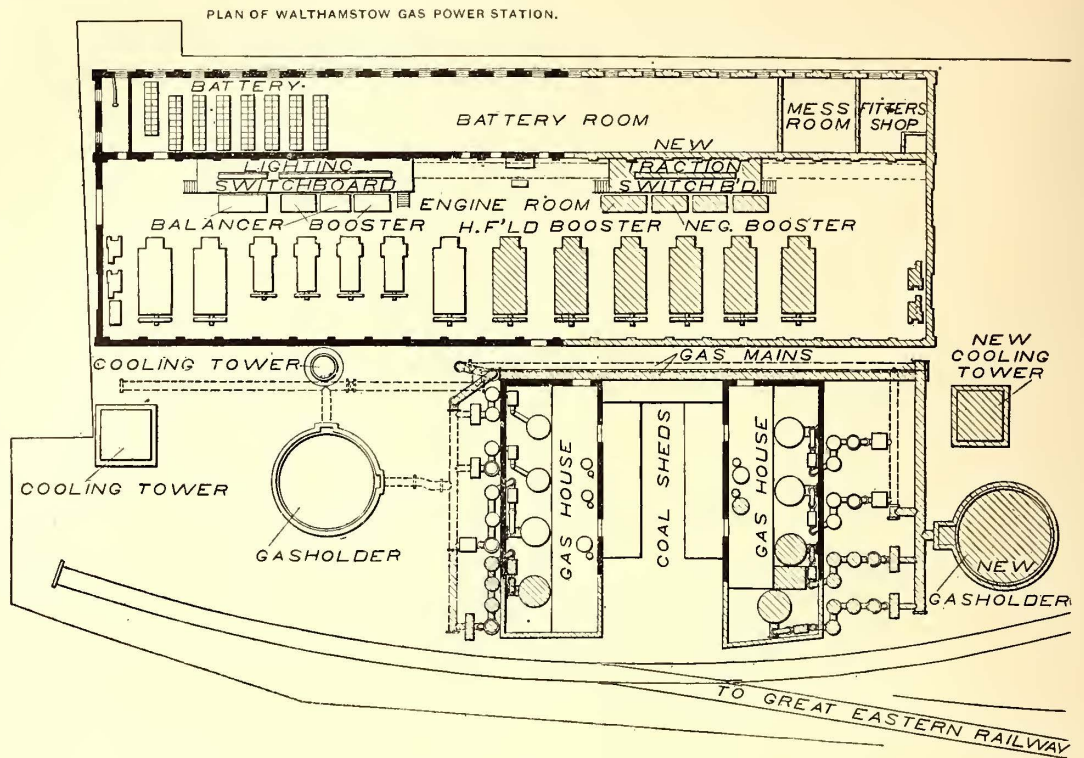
PLAN OF WALTHAMSTOW GAS POWER STATION
